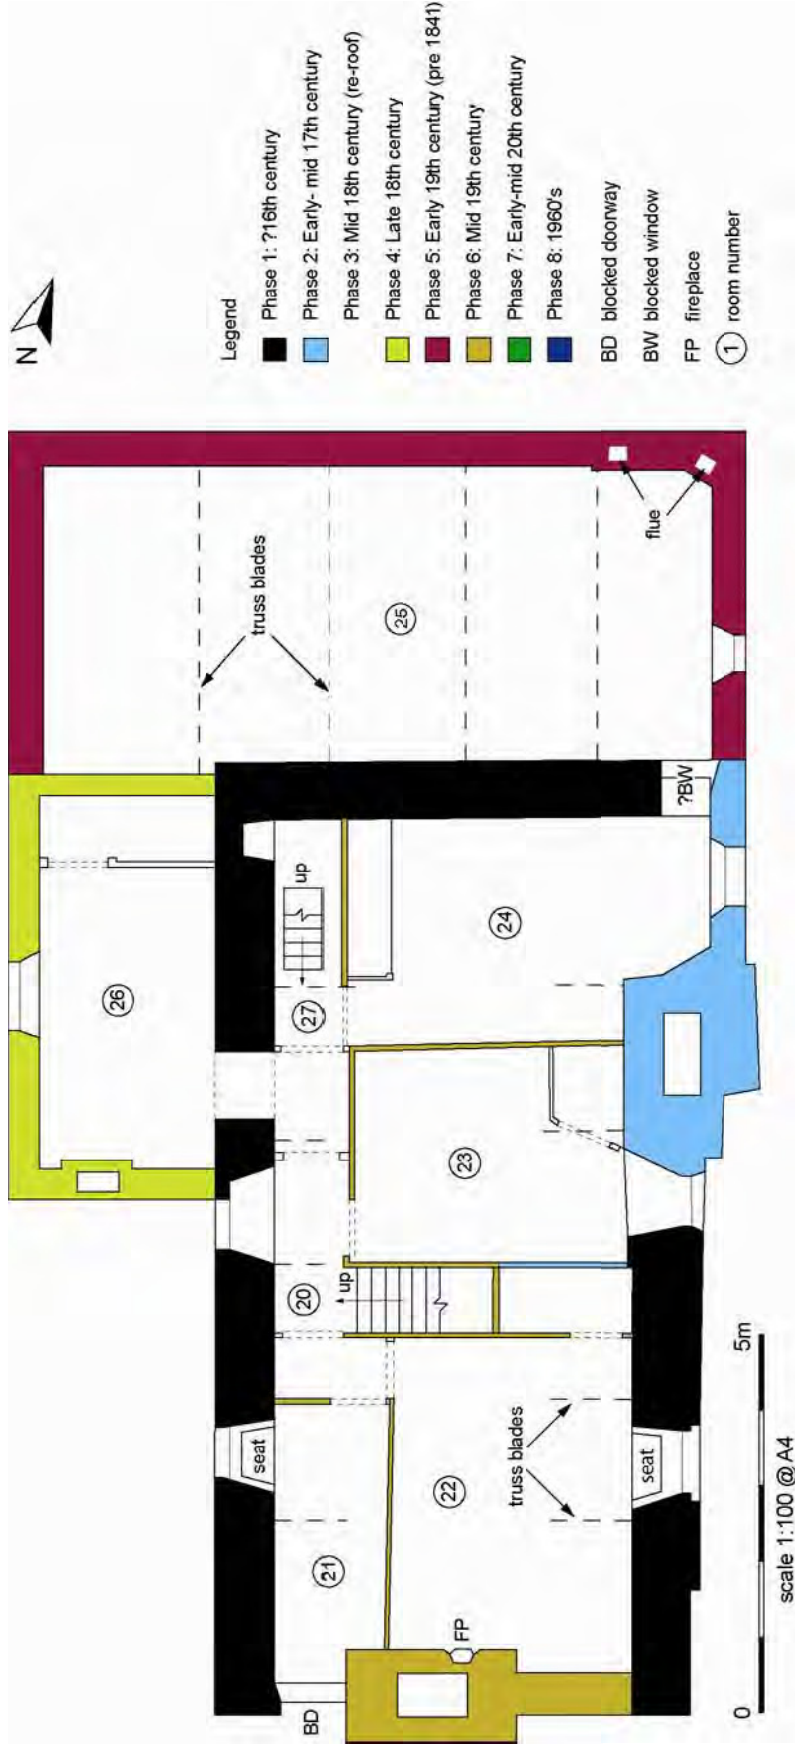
First floor plan of Higher Langlege Farmhouse, with phasing.
